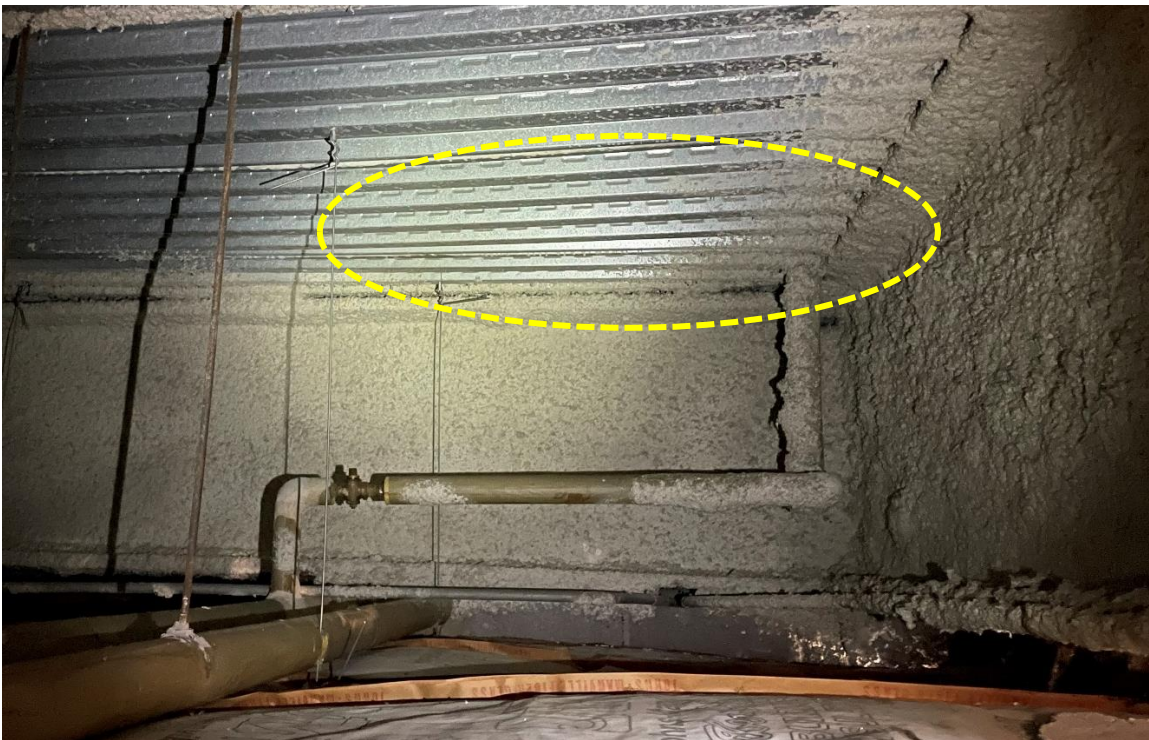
Second floor and ceiling system looking west near the impact area. Note utilities, beam connections, and fire proofing are intact. Slight visible distortion in metal deck circled in yellow.
